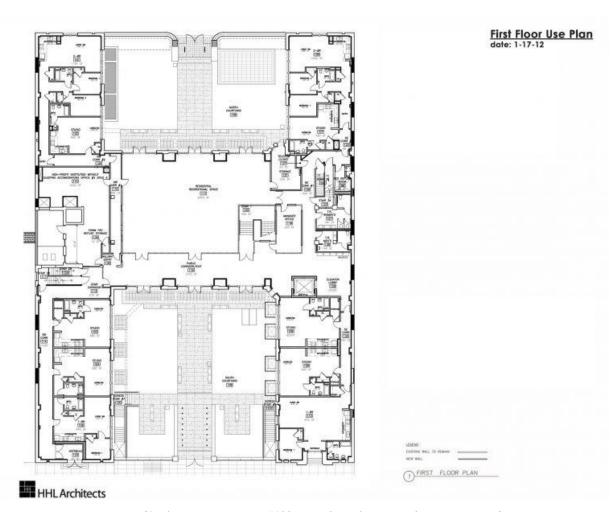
El Barrio's Artspace PS109 First Floor Plan, Image from Artspace website.
